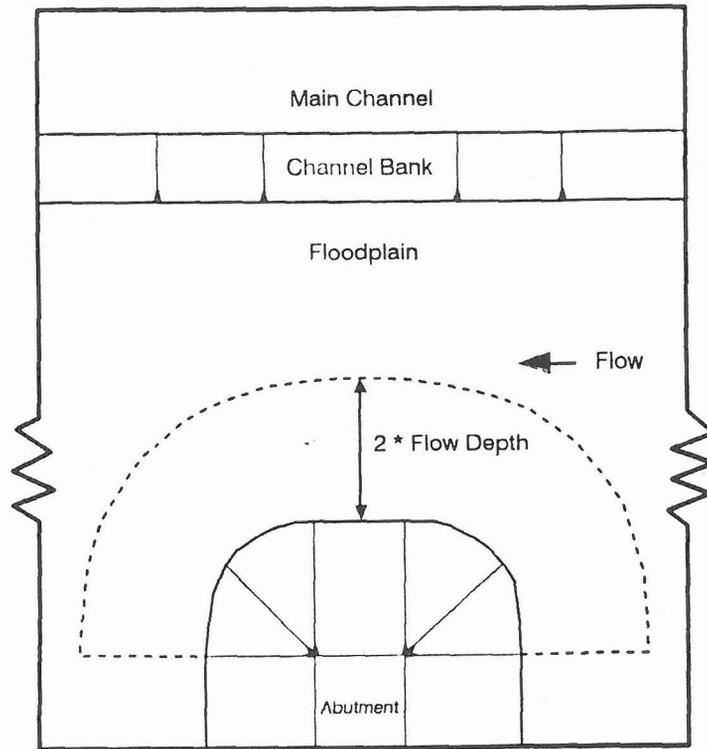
Plan View of the Extension of Rock Riprap Apron.
